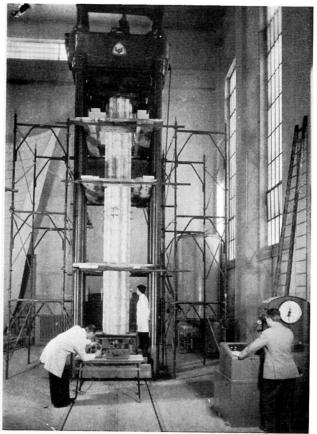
Milan Cathedral. Model of column under test. Scale 1:4.
